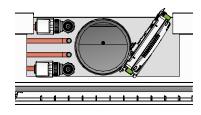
ADAPT Parasol EX 1290 with the valves mounted and with guide kit plate
